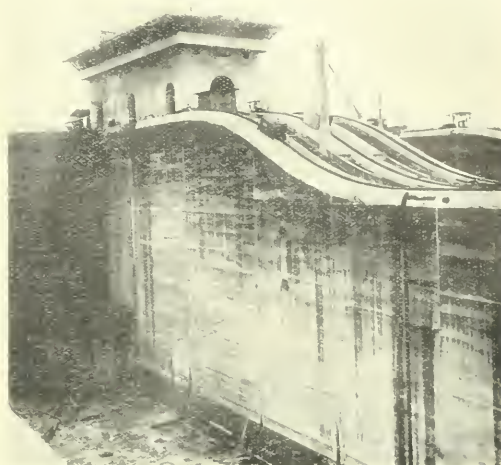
View of channel, showing control house, centre wall and towing track incline
